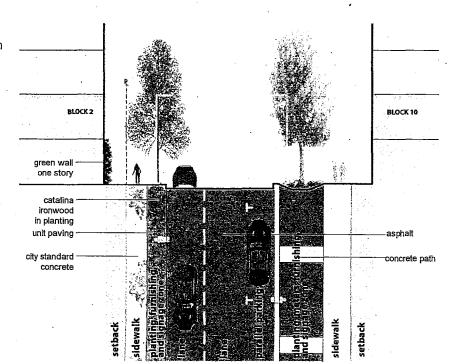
Street A, cross section between Block 2 and Block 10
